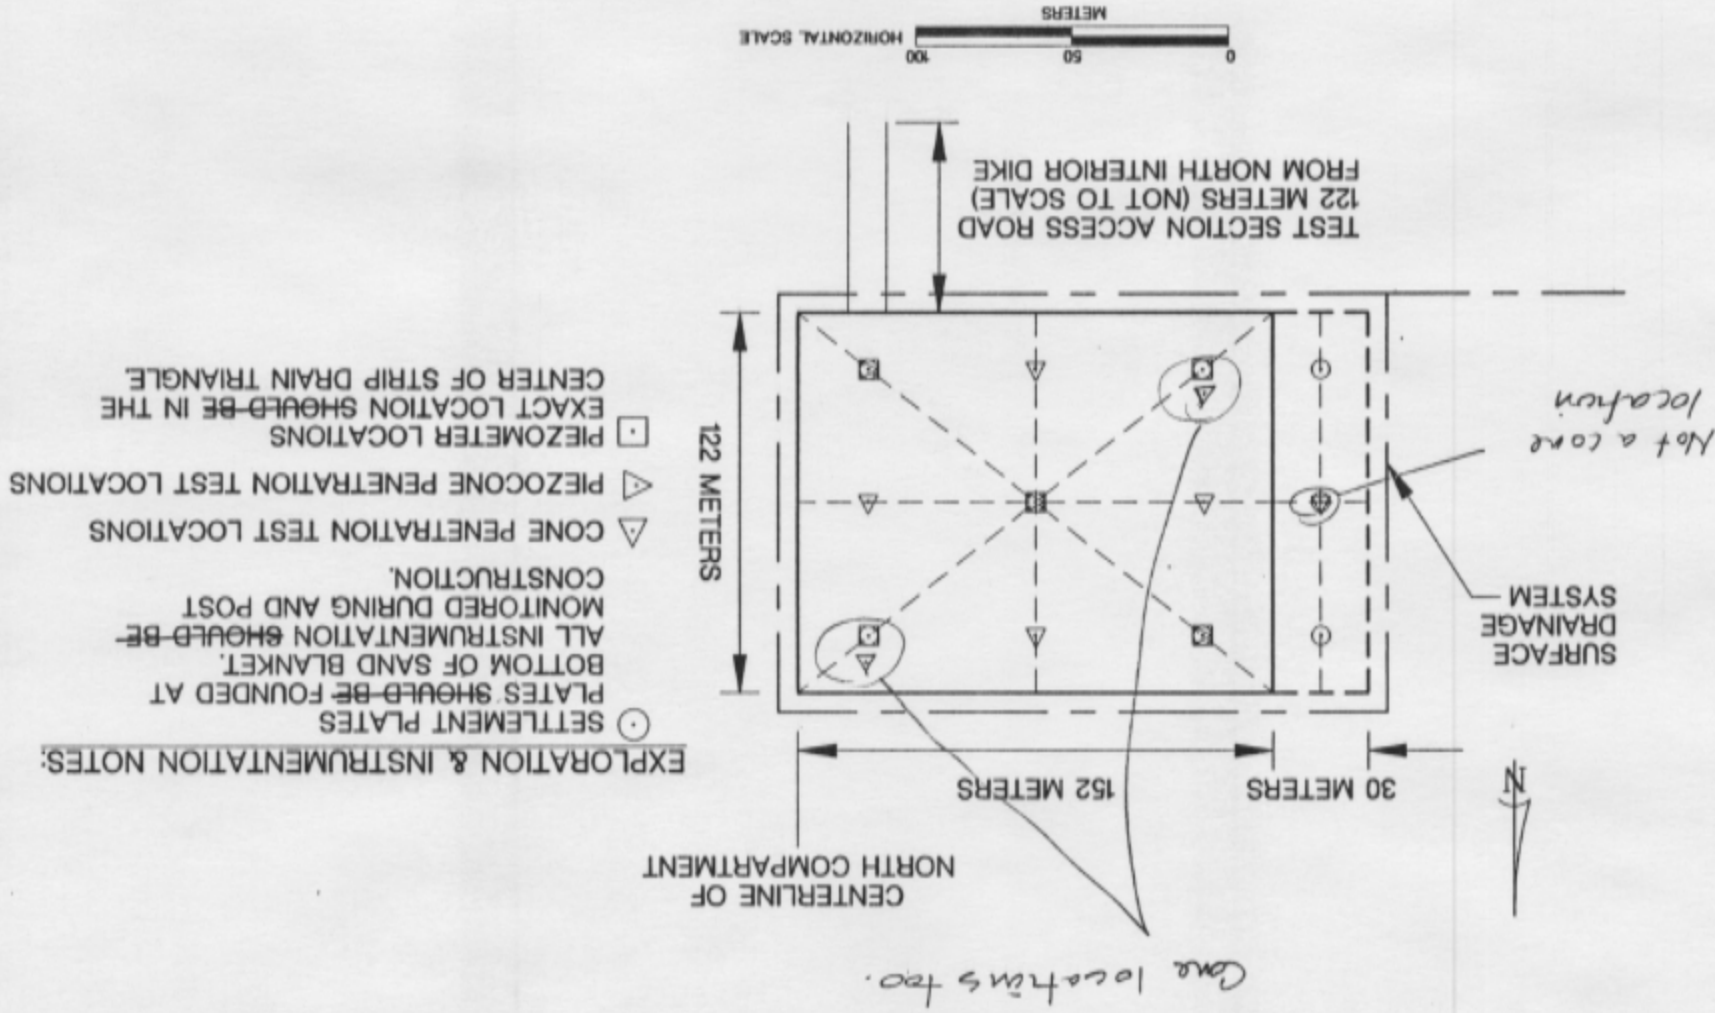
Plan View of Craney Island and Location of Vertical Strip Drain Test Section
